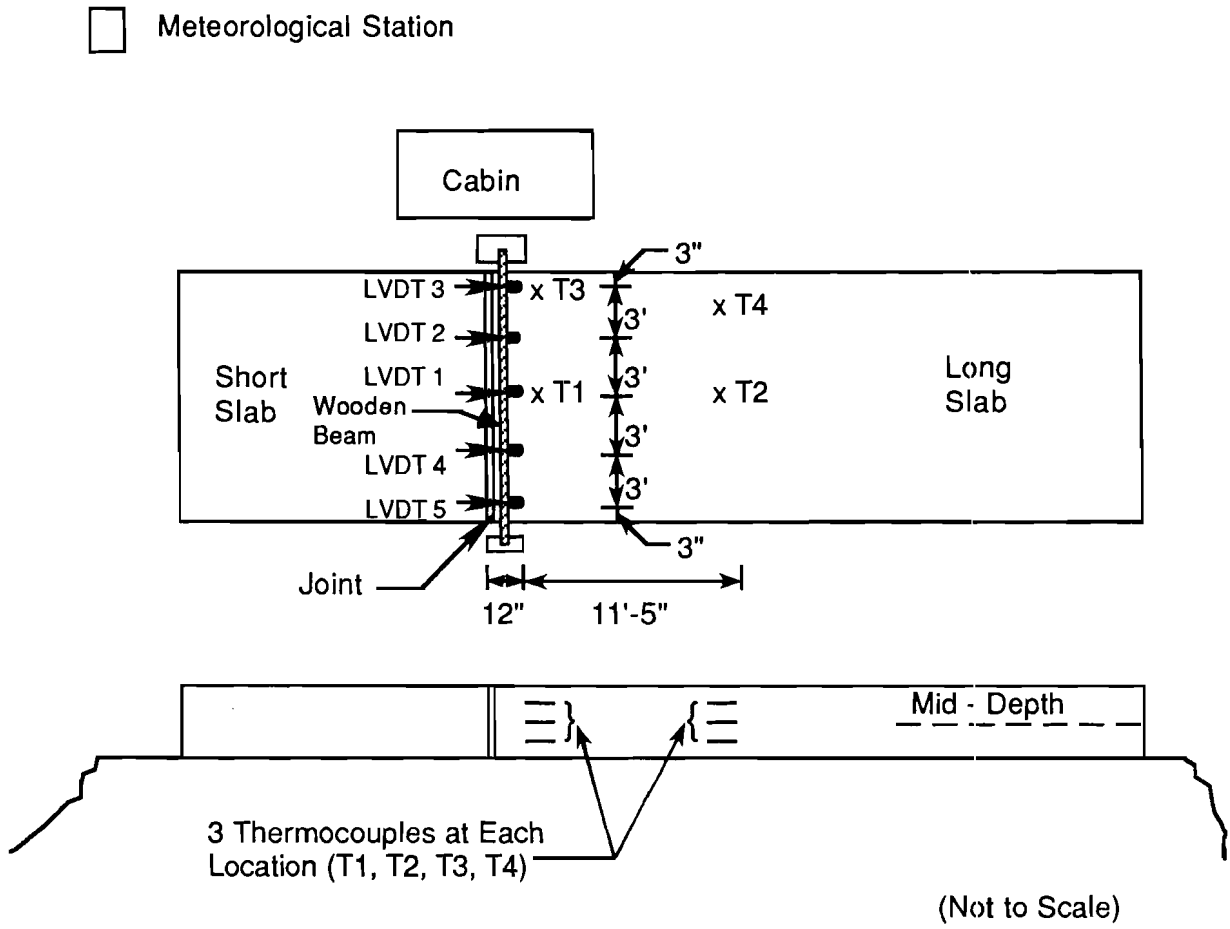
Location of the thermocouples and disposition of the LVDTs.
